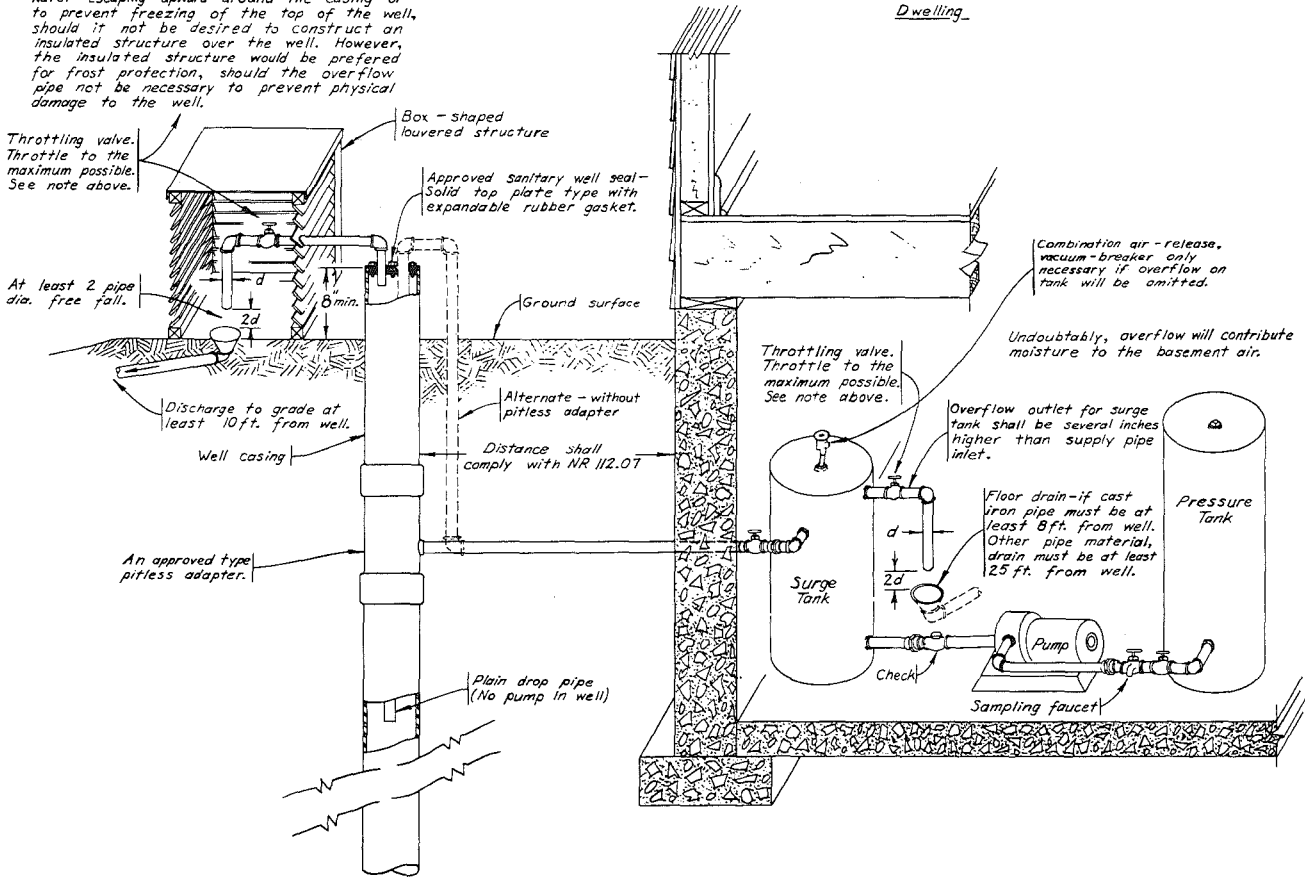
Pump Installation for Flowing Well Showing alternatives of Above-Ground Discharge or Approved Pitless Adapter Installation with a Surge Tank and Water Pump and Overflow Options at the Surge Tank or Top of the Well, if either is necessary.
